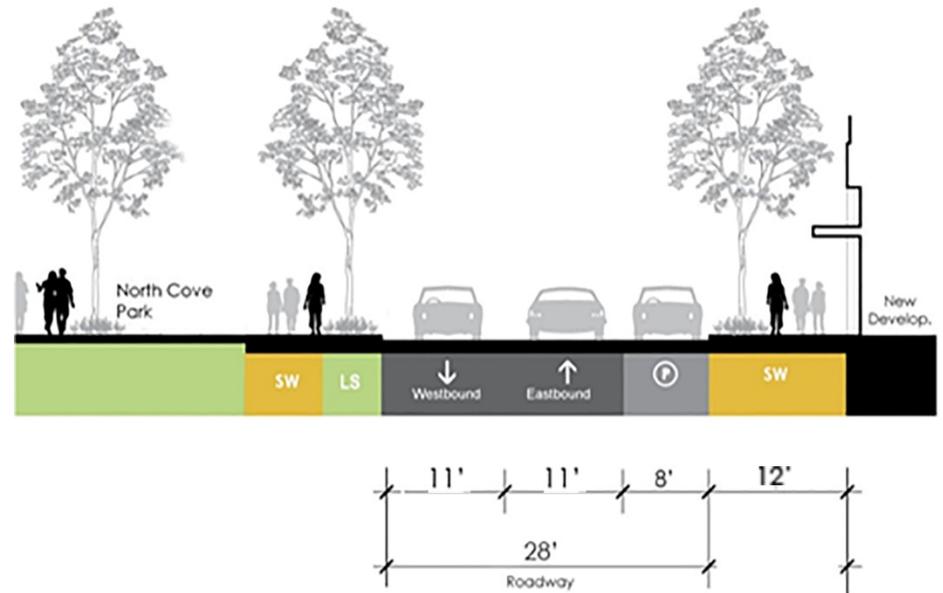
Retail Street Illustration (18th St NE View Looking East to Main Street)
